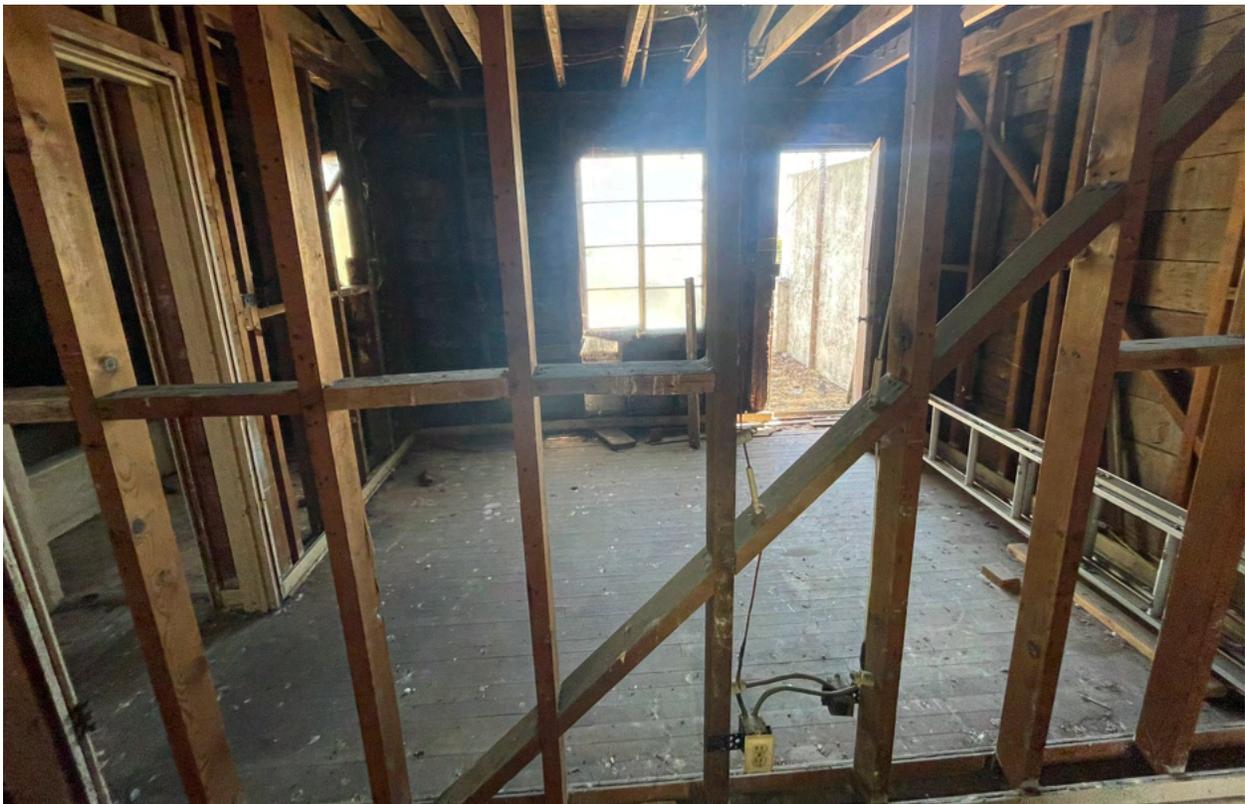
(Top) Third Floor of “Wally’s Apartment”, master bedroom, looking east, Groundwork Preservation LLC, 2025.
